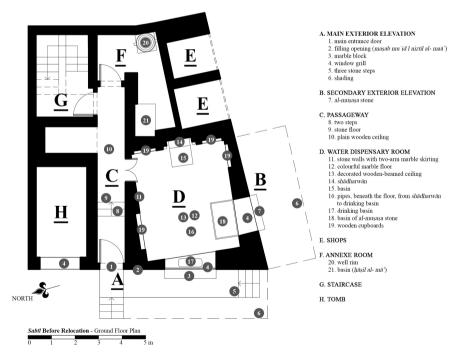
The ground floor plan of Sabīl al-Maghlawī before its relocation. *Source*: authors.
